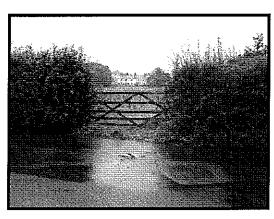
Manhole Ref. 4 – Plan View Looking towards Site
